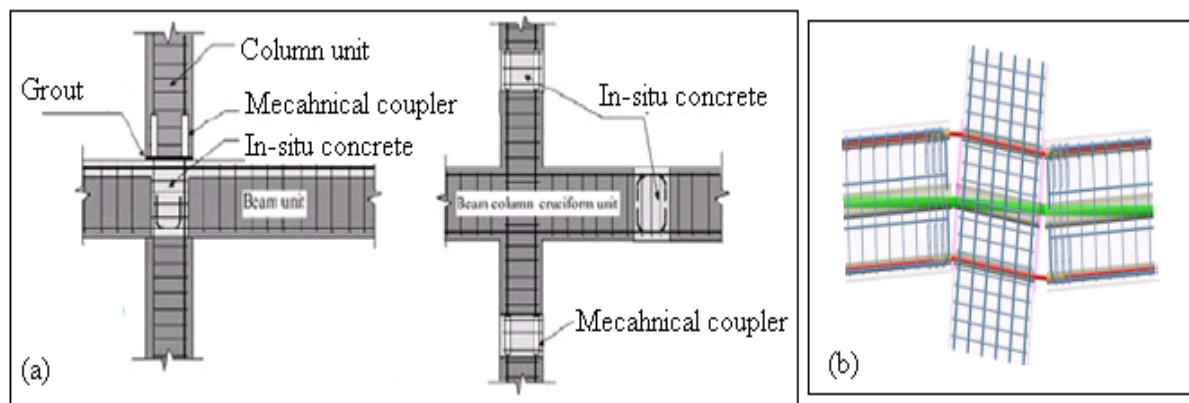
(a) jointed ductile system, (b) cable stayed connection type (Ericson 2005)
